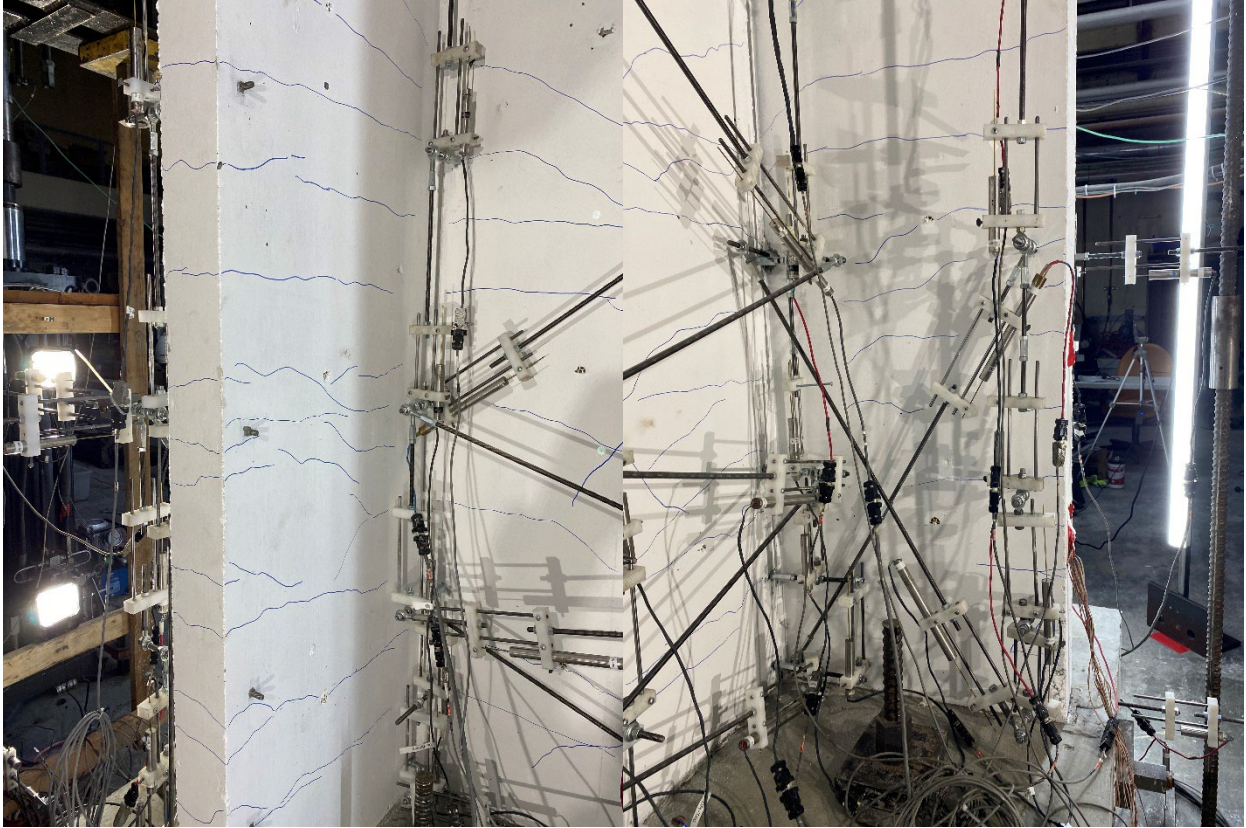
Cracking condition of CW-1 at the end of WLP (Inside surfaces of the east flange (left) and west flange (right))
